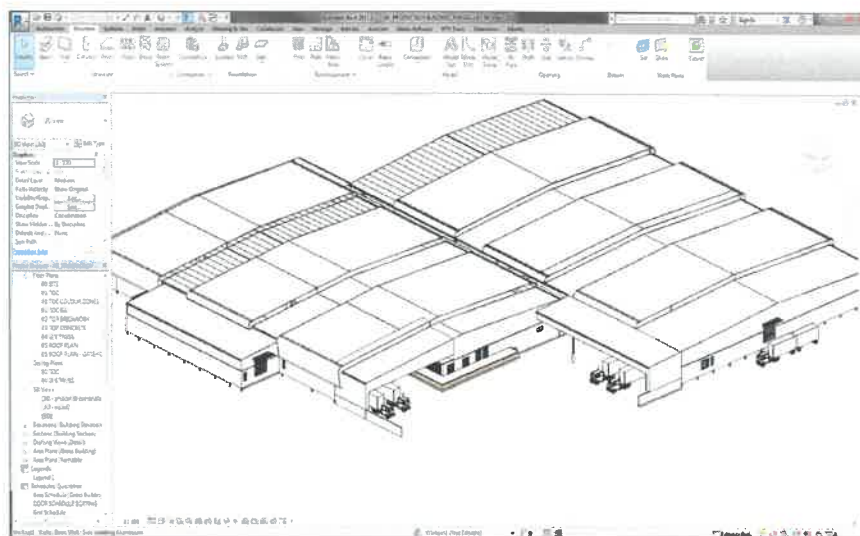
3D BIM Image of the Manufacturing Building (Architectural Model)
